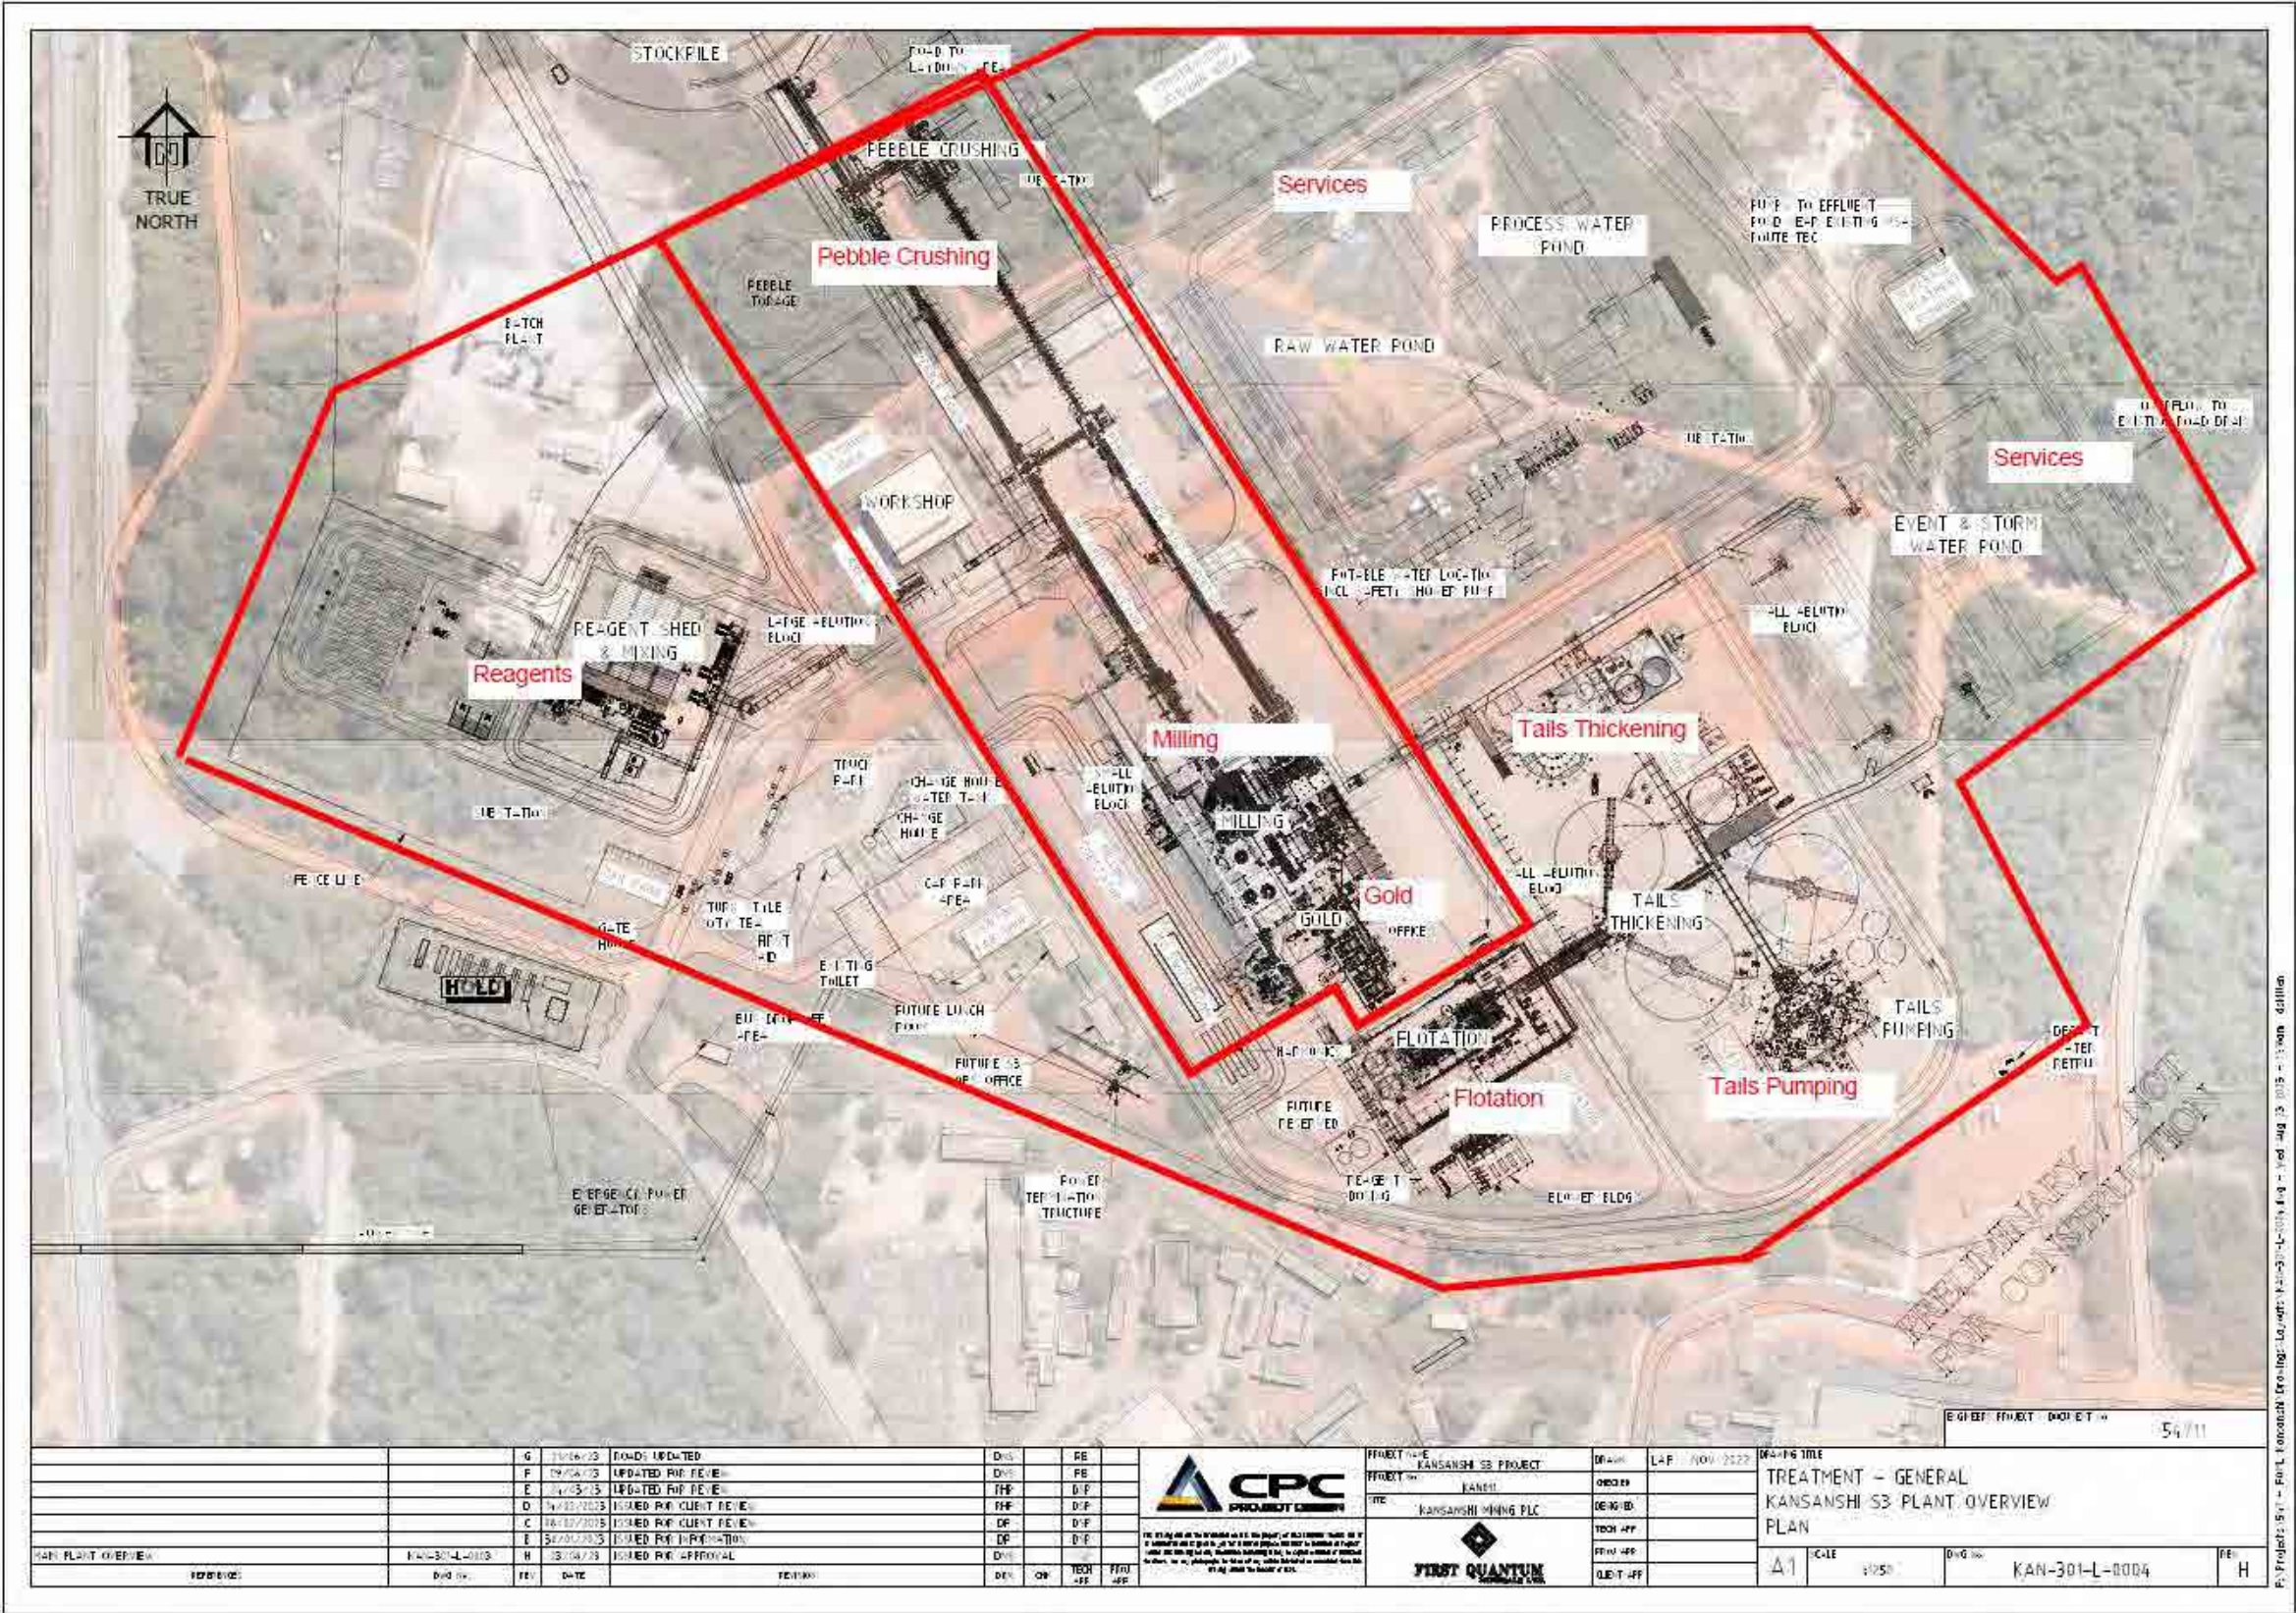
Kansanshi S3 plant, general arrangement plan (source: CPC)
